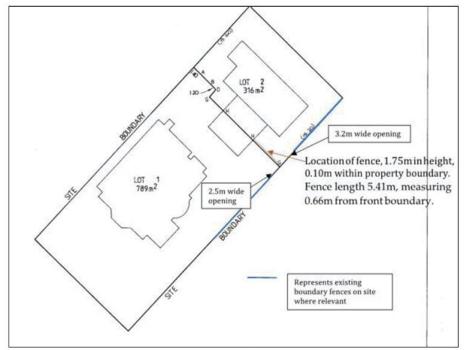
location of the proposed fence at 2/409 Argyle Street, New Town.
